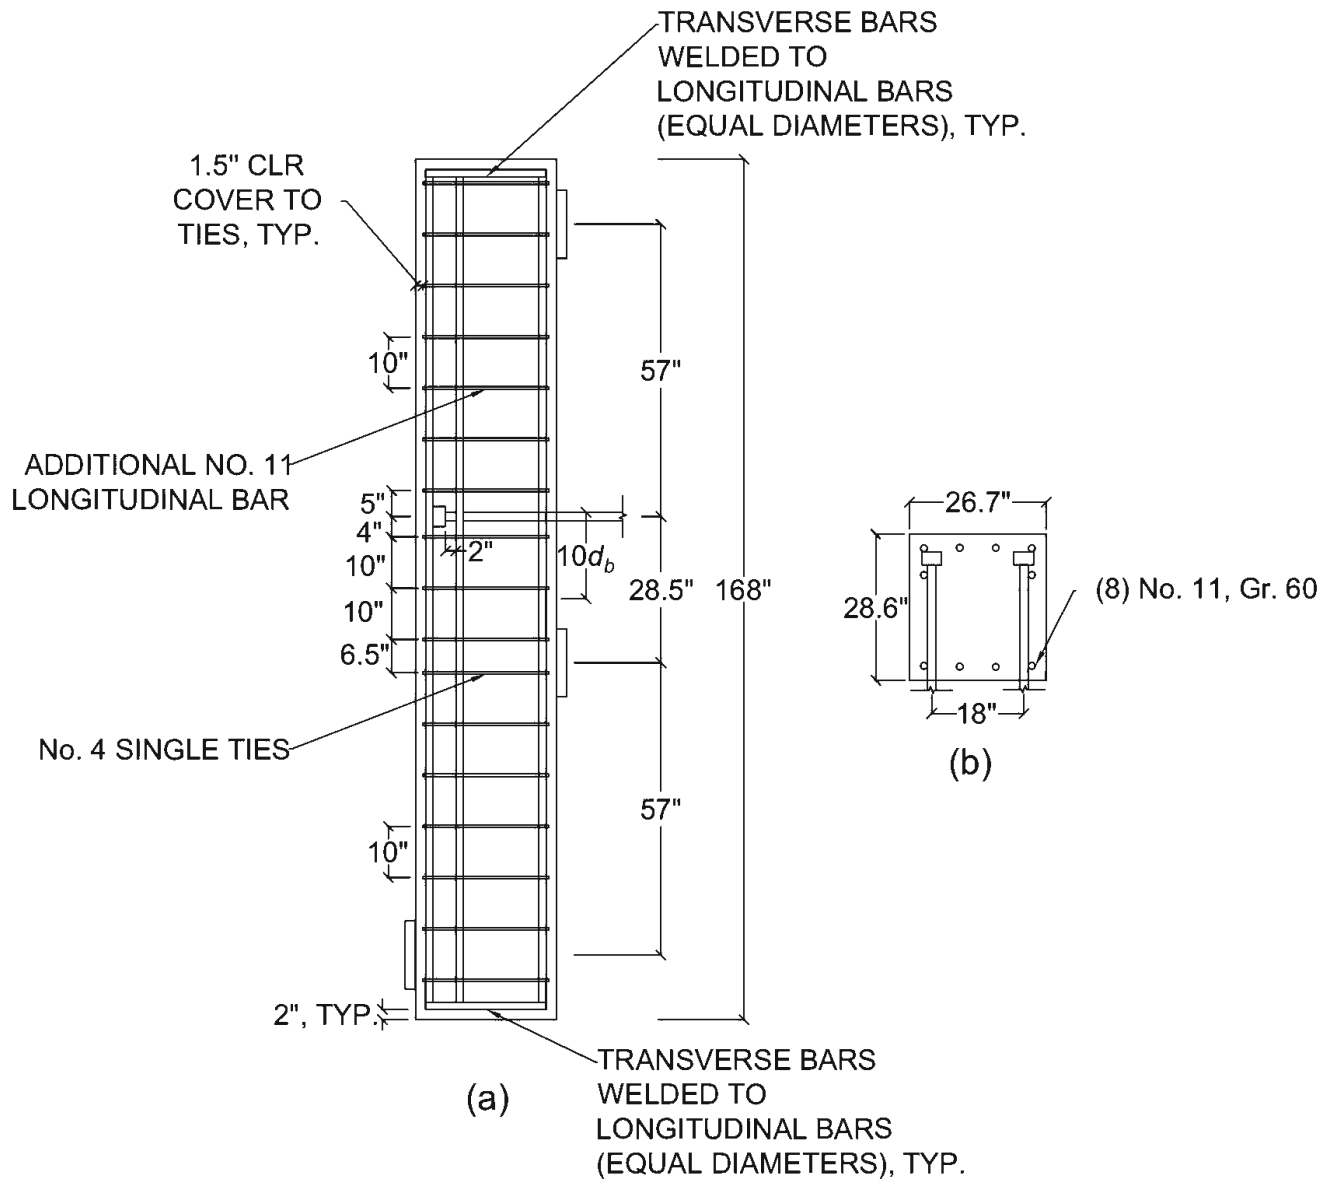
Details of reinforcement layout for No. 14 headed bar specimen 14-16A: (a) elevation, (b) cross-section
